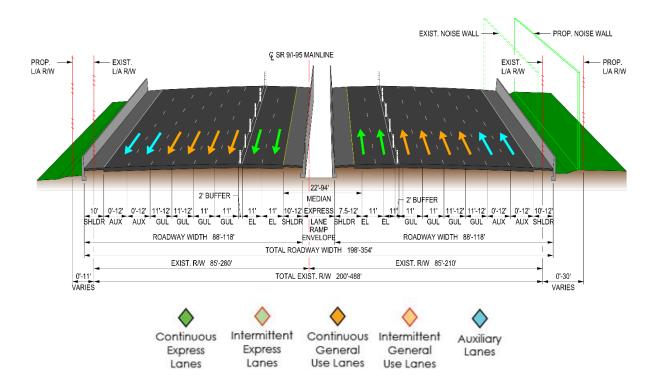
6: Proposed Typical Section - Alternative 2 – I-95/SR 9 Mainline and Express Lanes
